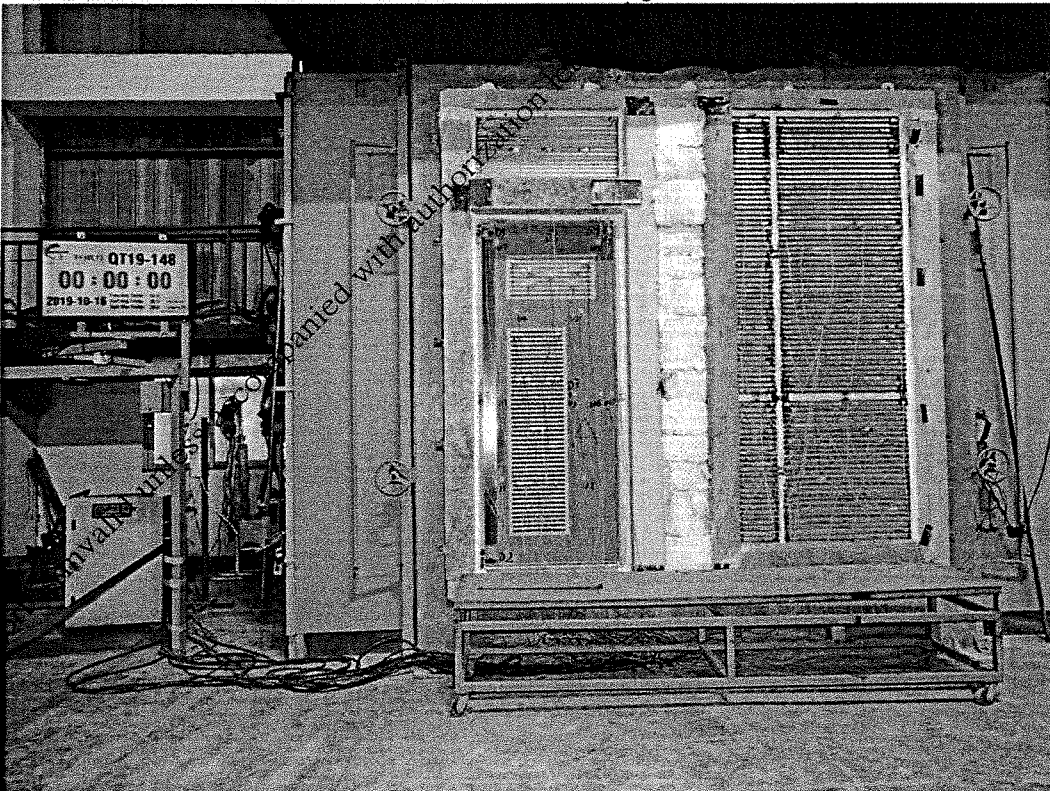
Unexposed surface of the specimens before test. (Left: Door A and Louver C; Right: Door B)
